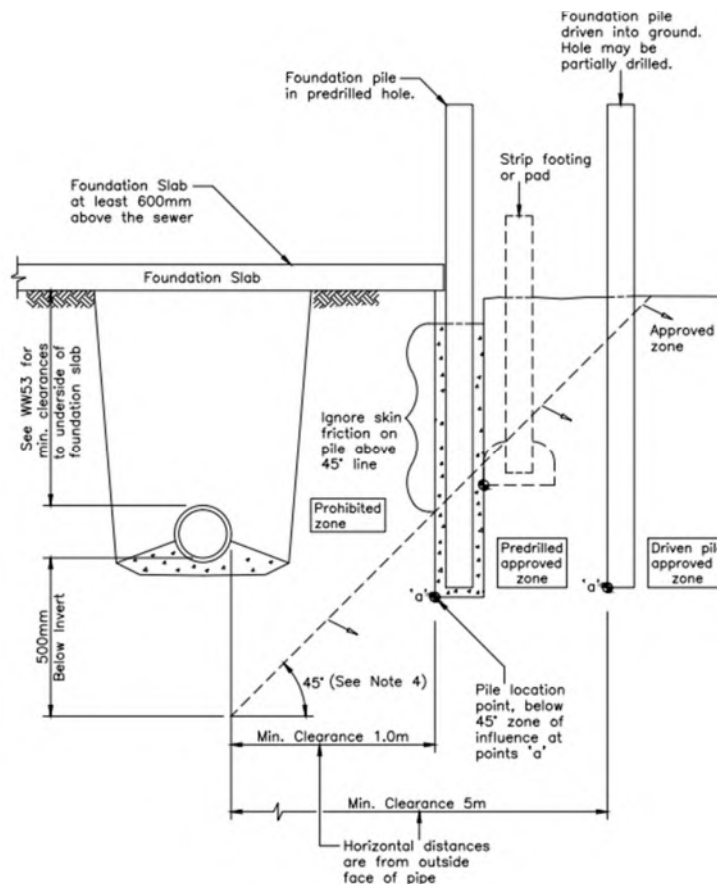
Typical Drain Bridging Detail (Watercare - WW54)
